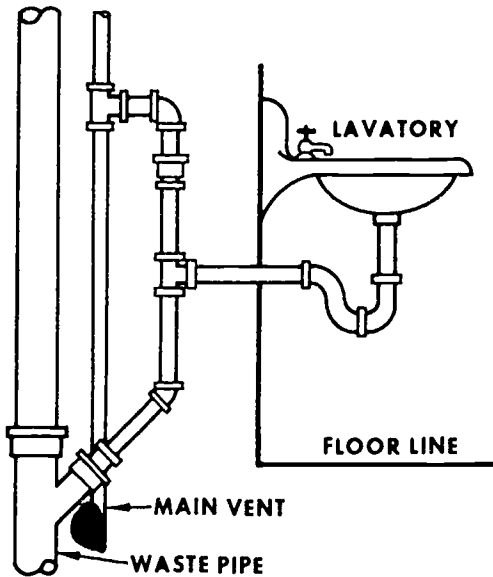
Individual ventilation of lavatories, sinks, drinking fountains, etc.
